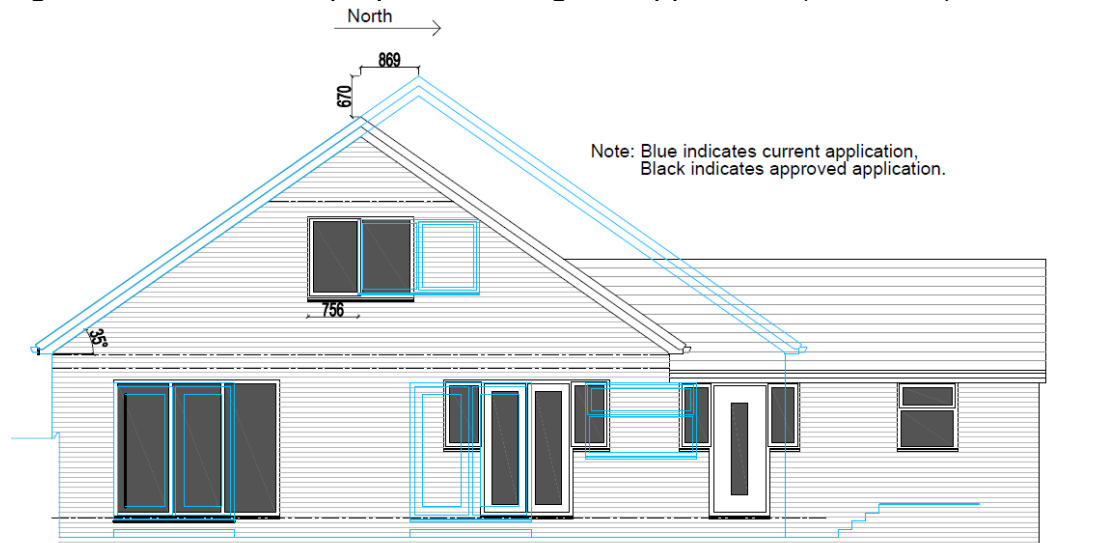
Previously approved rear elevation plan (black line) v 'as built' elevation plan (blue lines)
